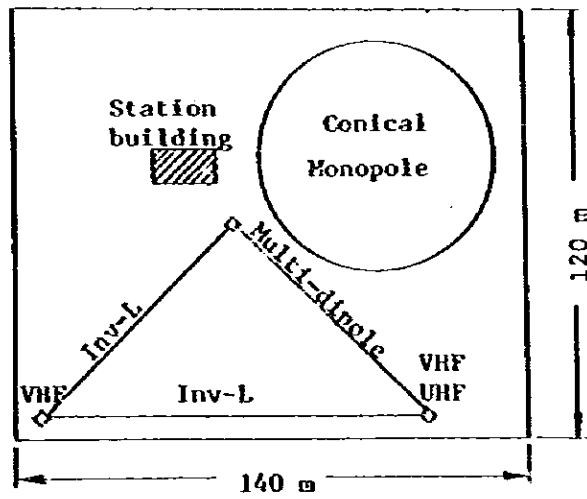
(2) Typical Site Layout for Class B Station
